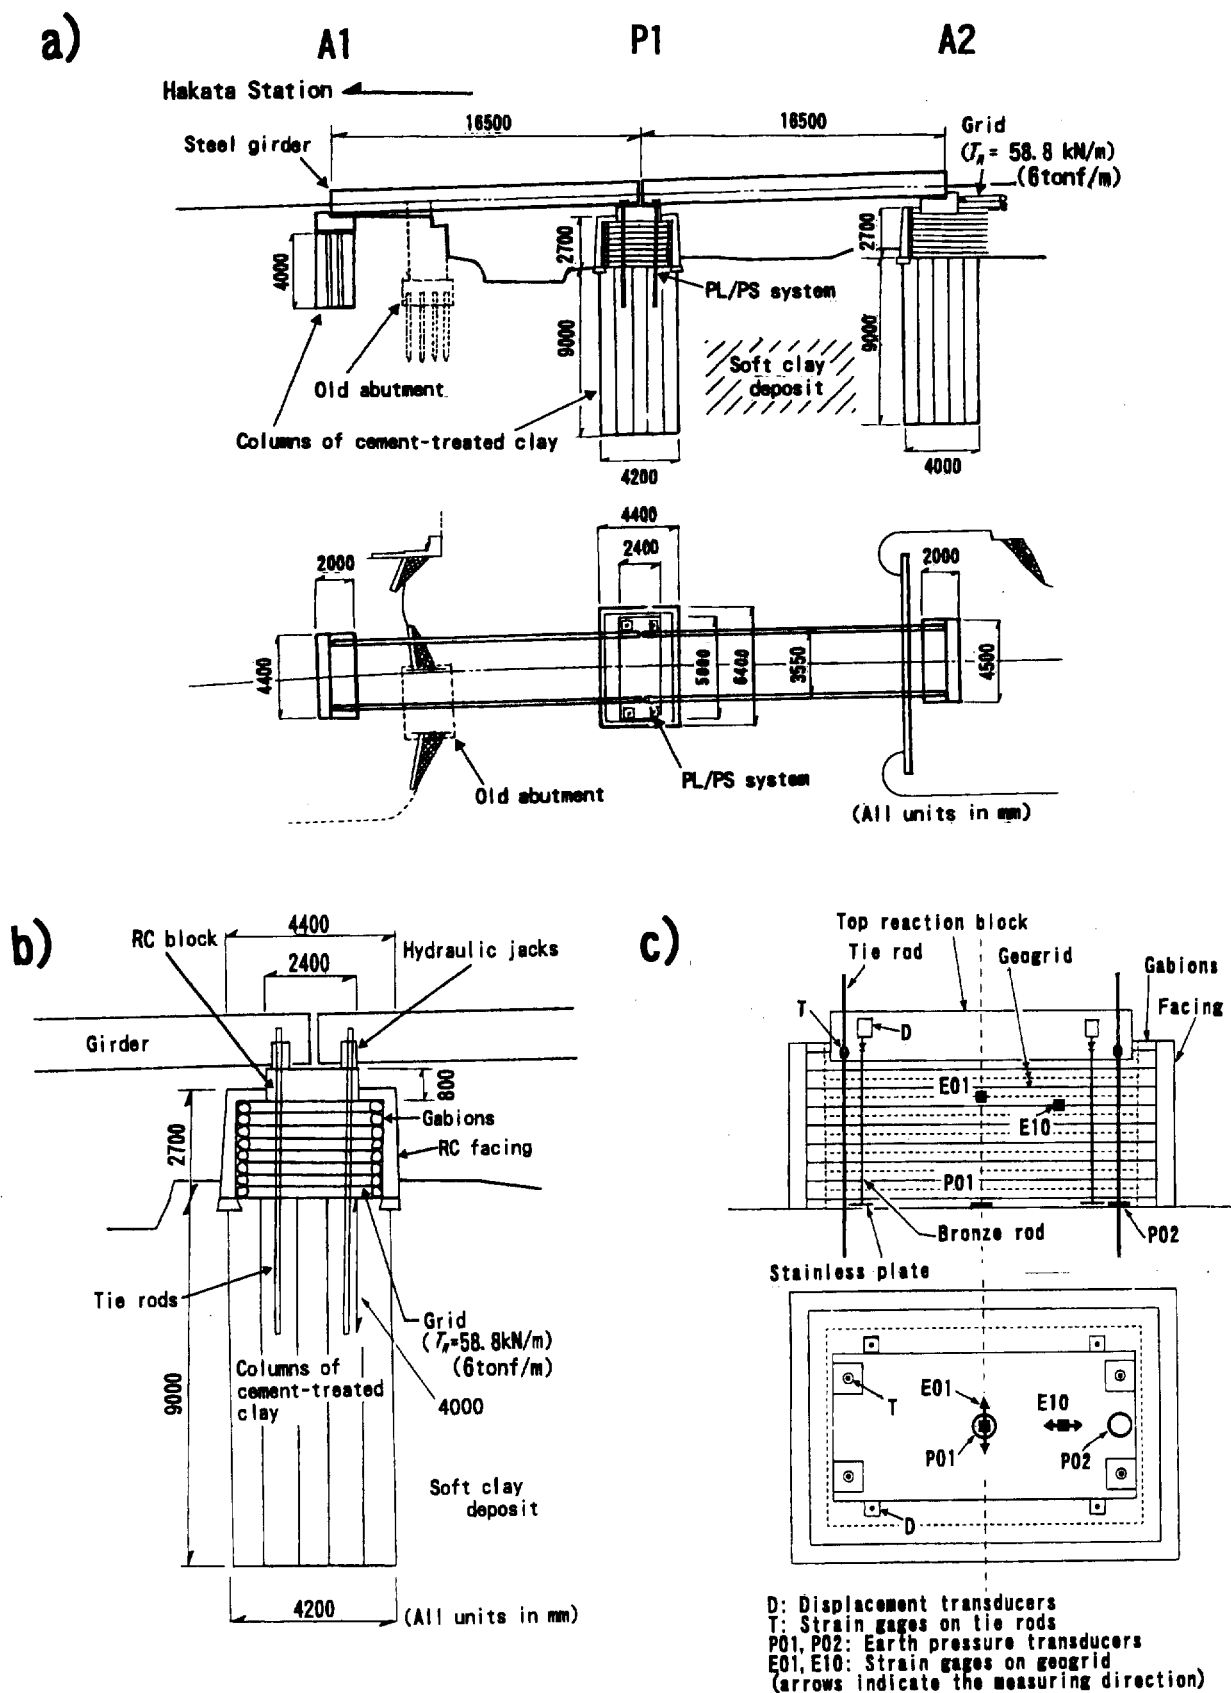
a) A bridge construction project involving the first prototype PLPS reinforced soil pier; b) detail of the pier; c) arrangement of the instrumentation described in this paper (Tatsuoka et al. 1996b).
